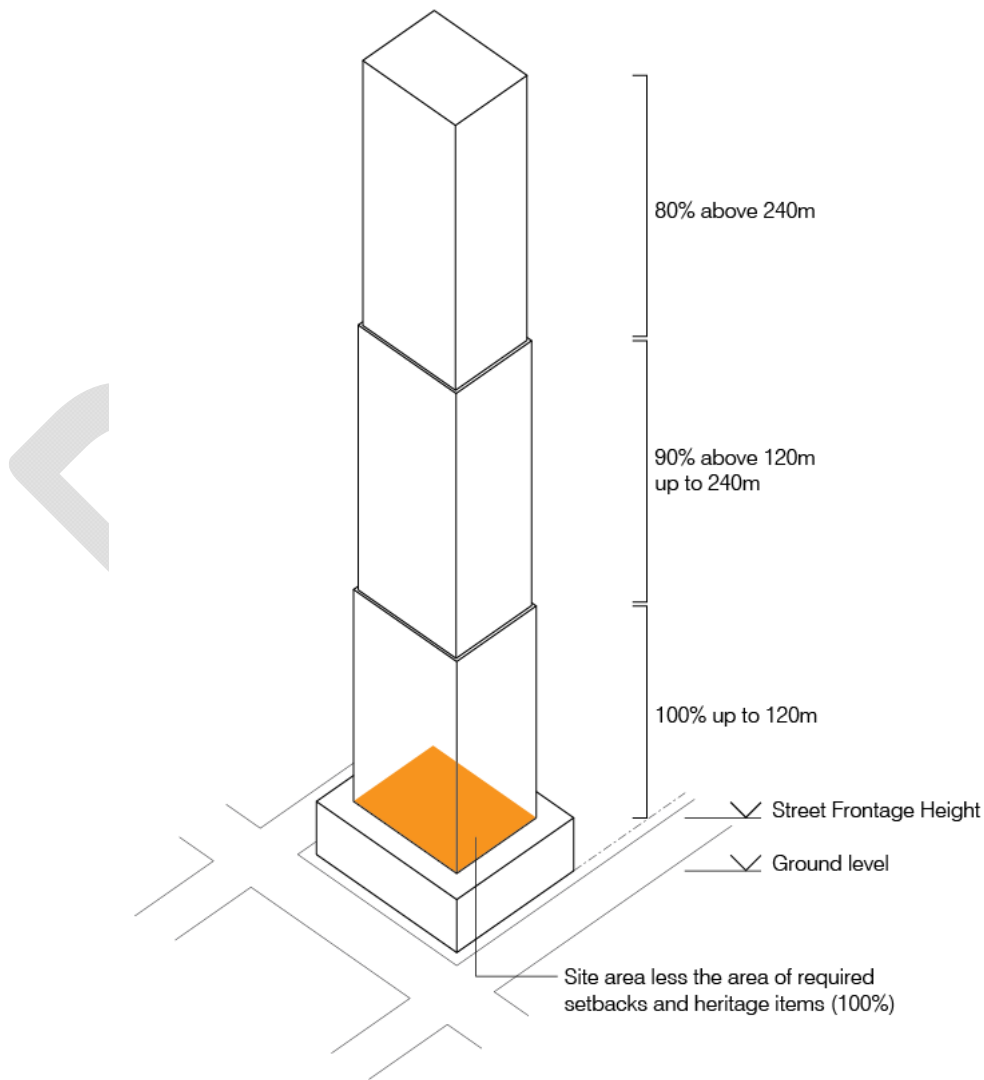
Maximum Building Envelope Area above Street Frontage Height
